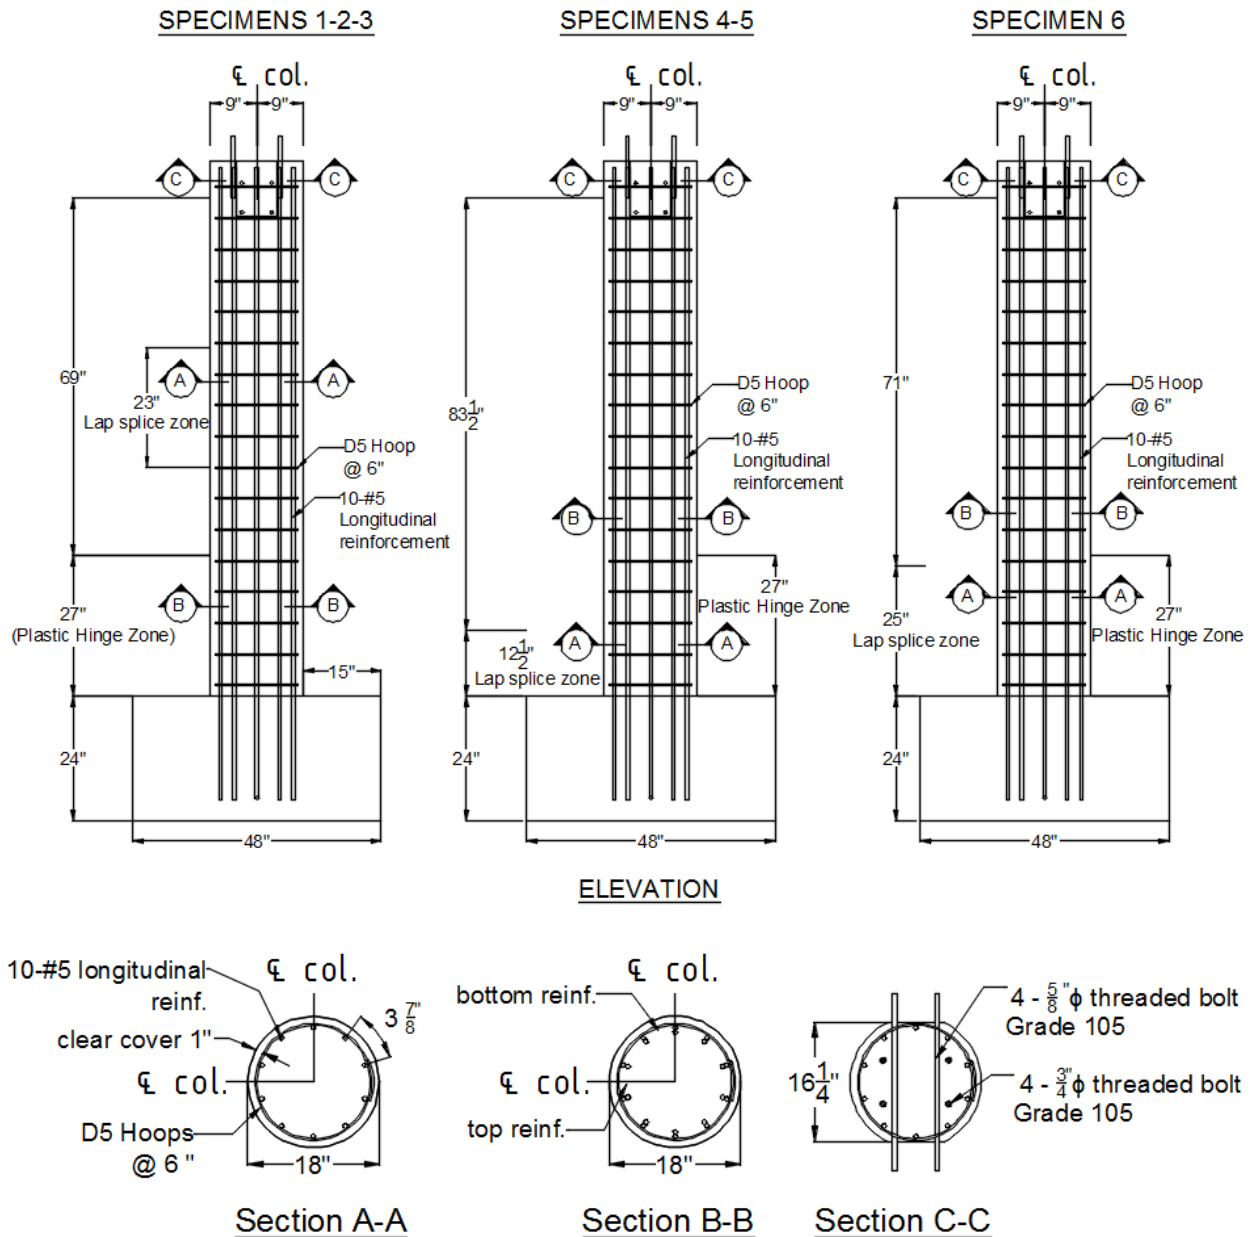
Geometry and reinforcement of RC Bridge column specimens
